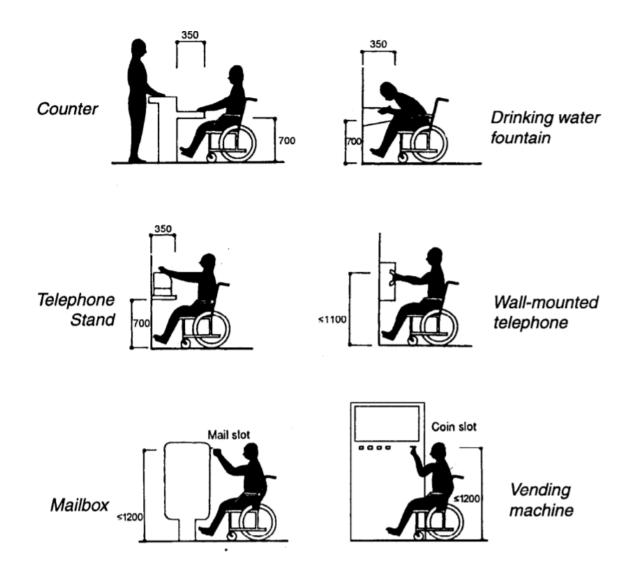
Architectural Dimension Plan (CPWD, 2008)
